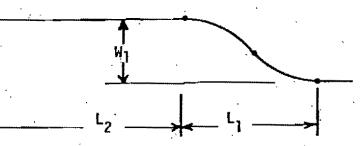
SUGGESTED DESIGN FOR DIVIDED DRIVEWAY ACCESS TO ARTERIAL STREETS (3)
